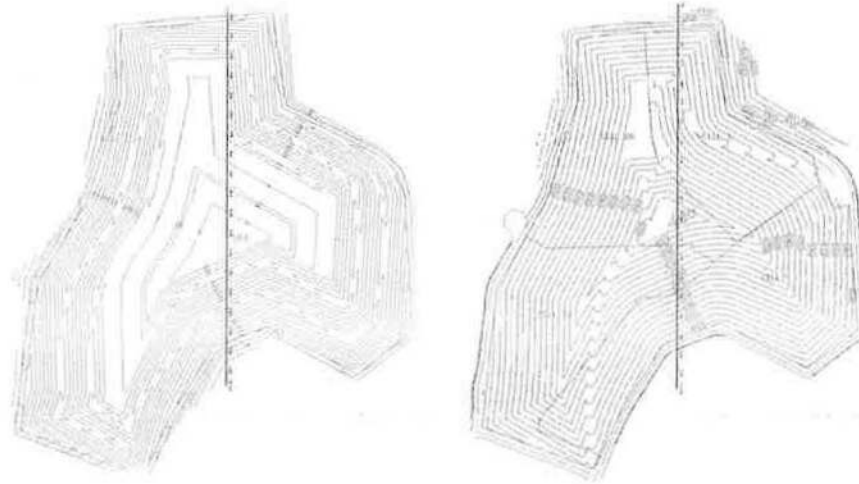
Landfill Plan View - Before and After Vertical Expansion
